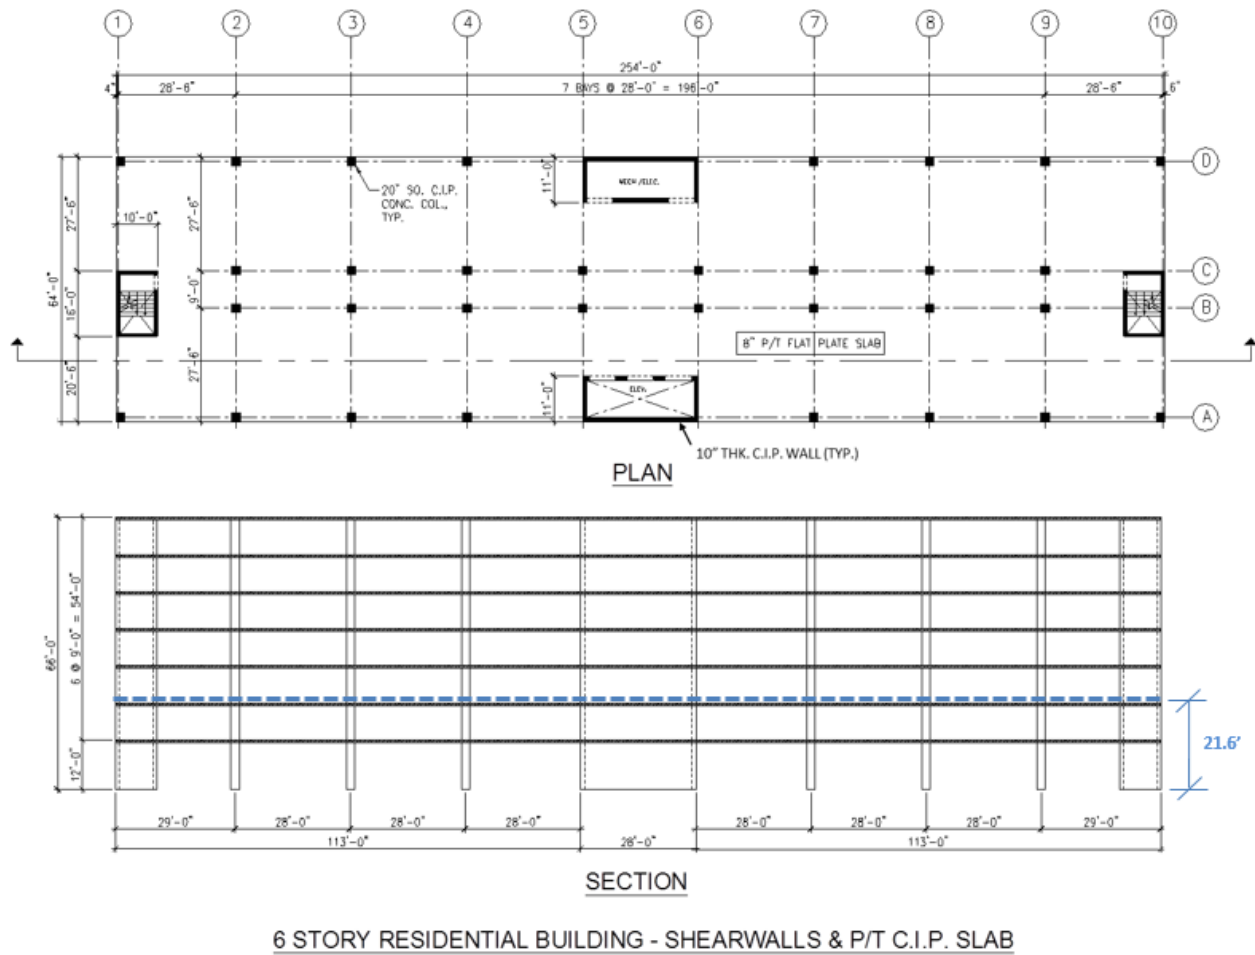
7 Story Residential Building using Special Reinforced Concrete Shear Walls and posttensioned flat slab supported on gravity columns
